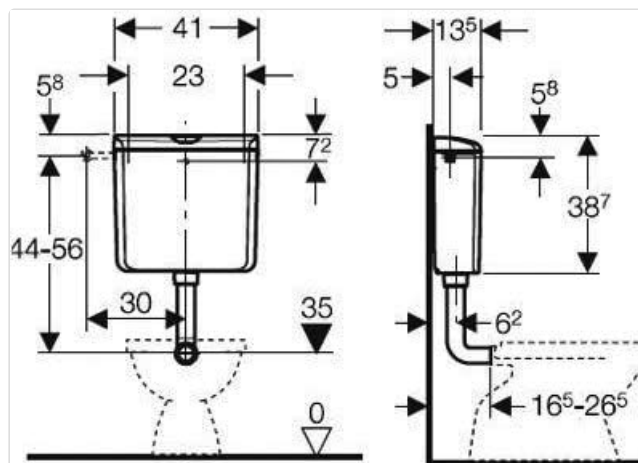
Dimensional drawing of the Geberit AP 110 cistern, showing key measurements for installation.
